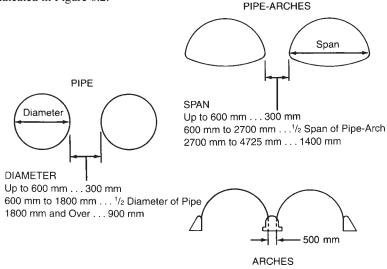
Minimum permissible spacings for multiple installations. Spacing can be decreased if CLSM is used as backfill.
